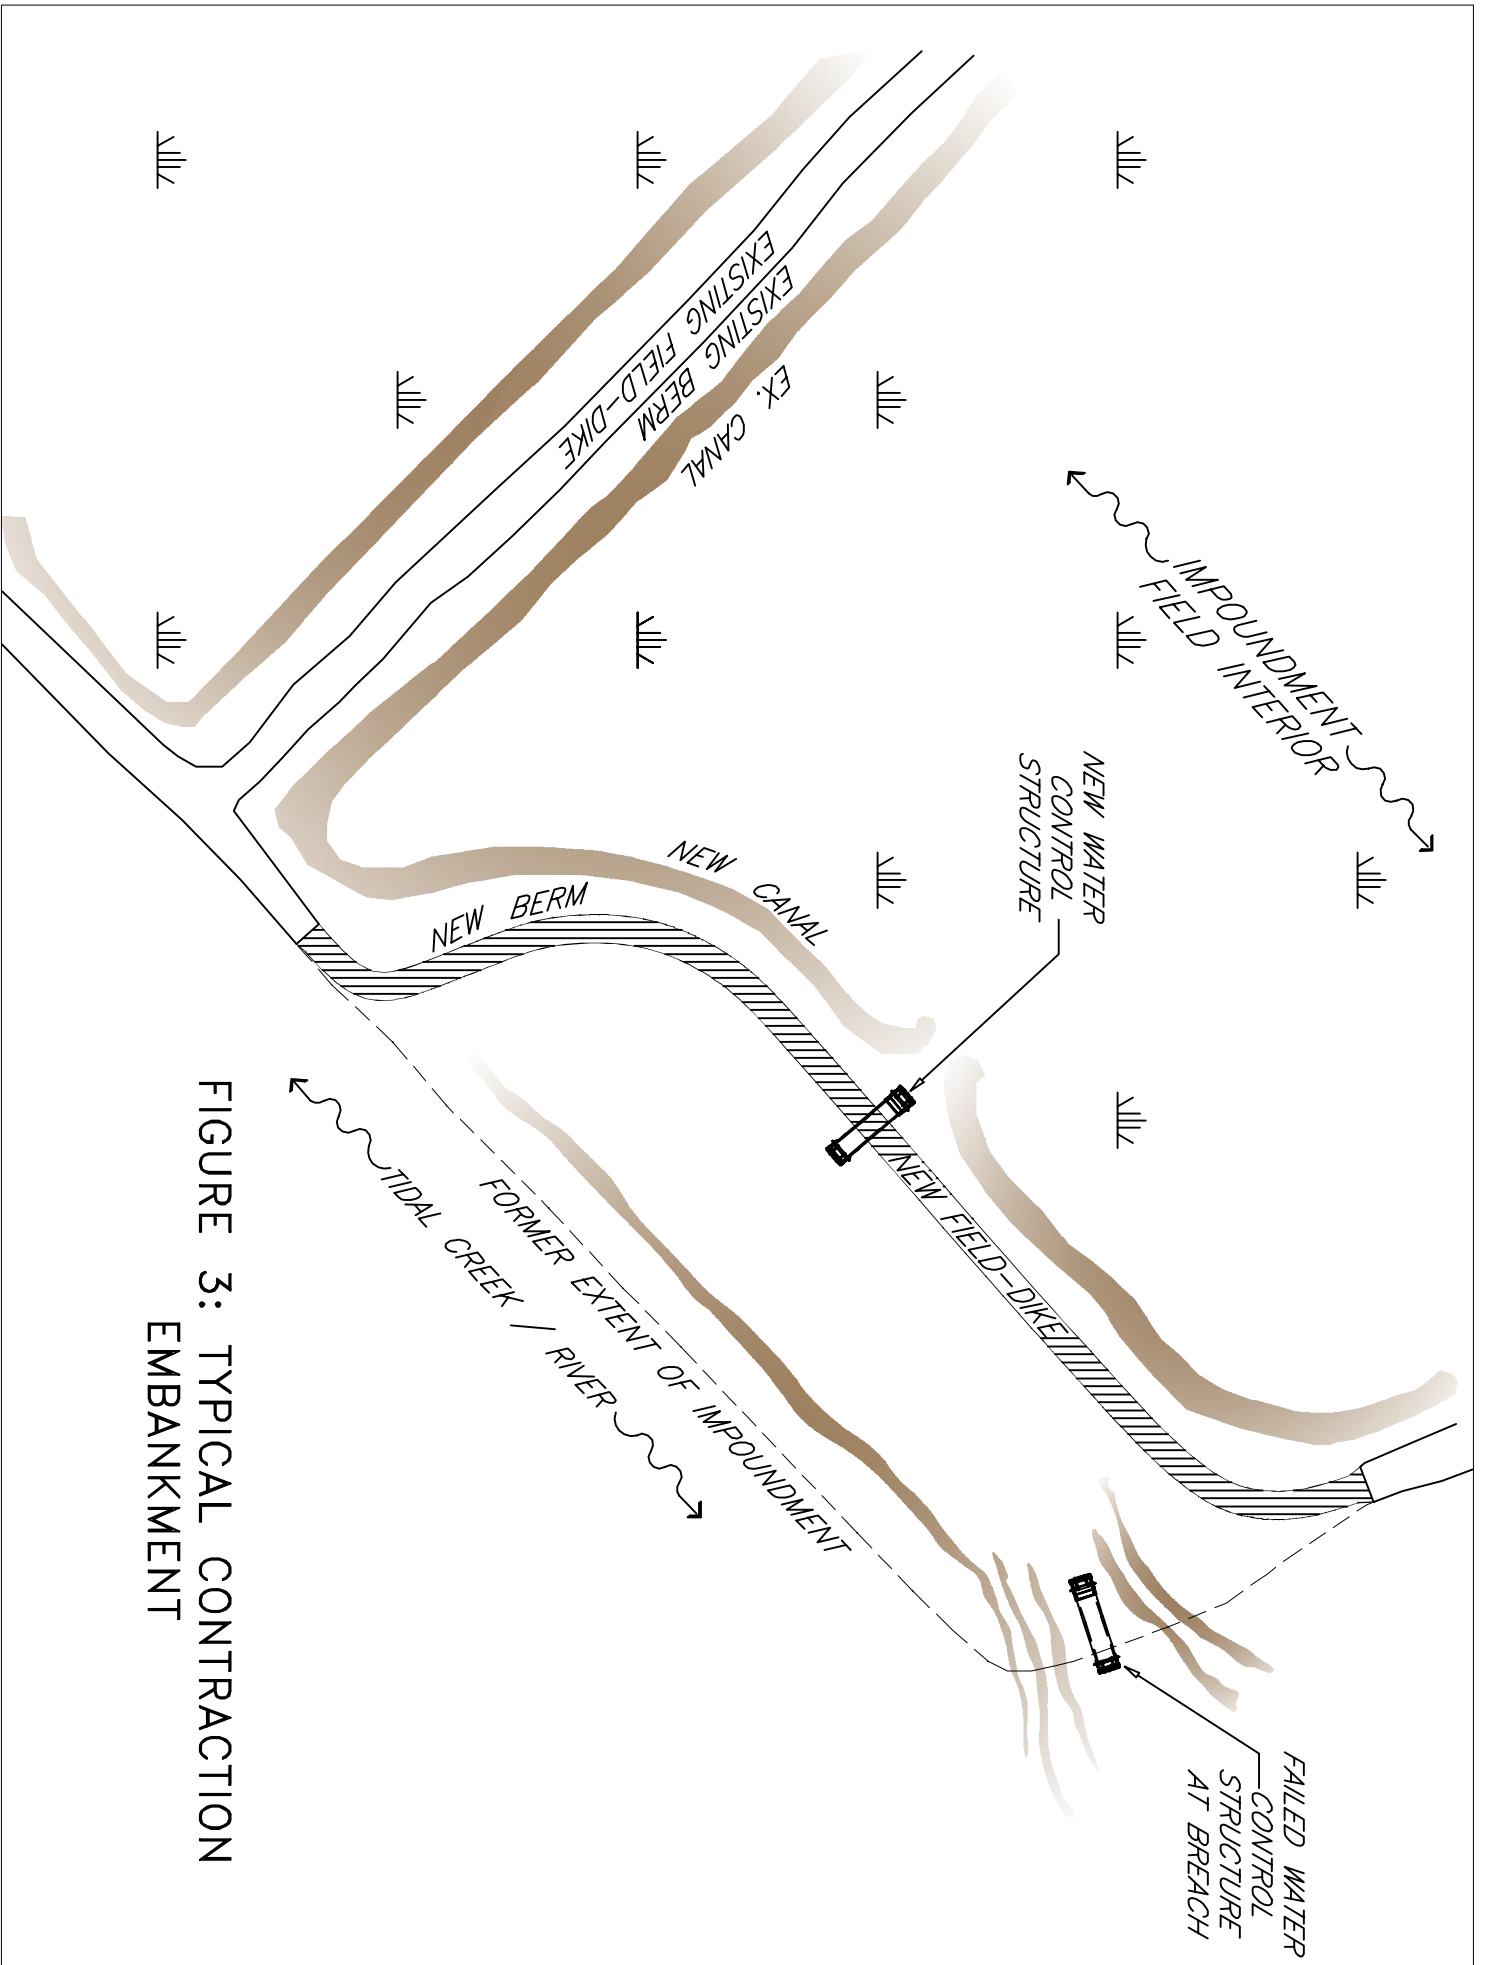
TYPICAL CONTRACTION EMBANKMENT
